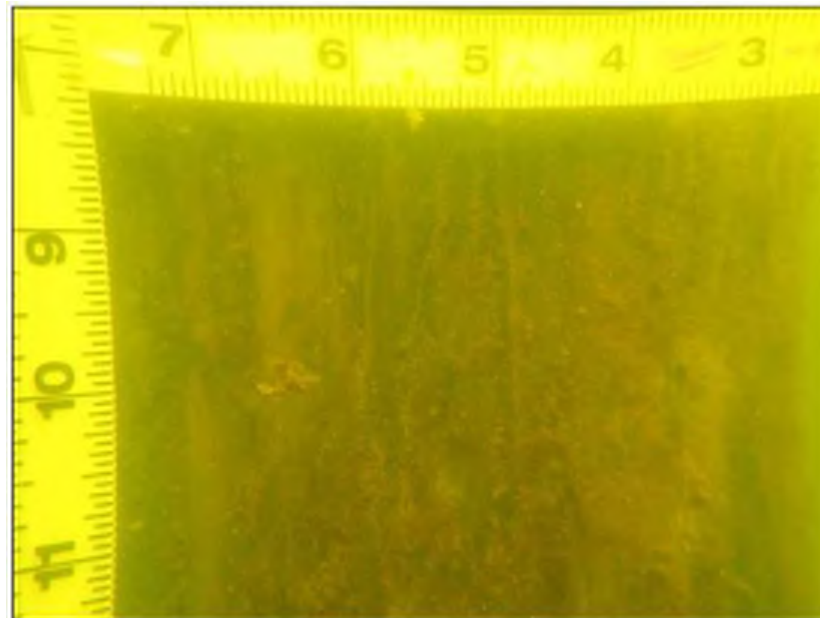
U.S. Coast Guard Dock and Pier Dolphins
